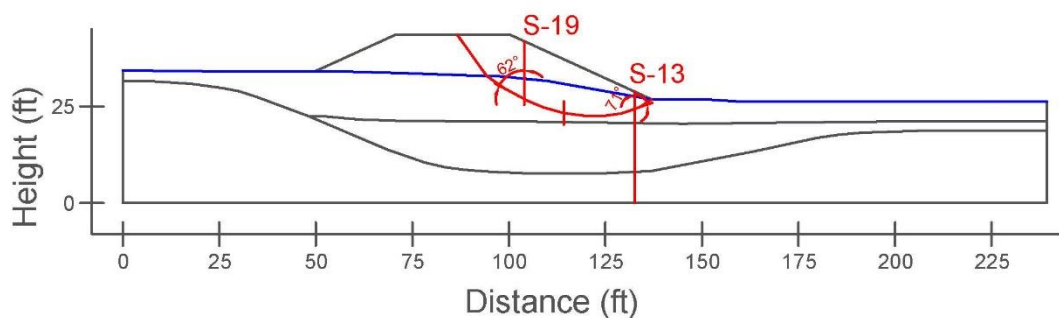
Sub-sectioning of the cross-section and failure plane for Metoki Road Embankment
